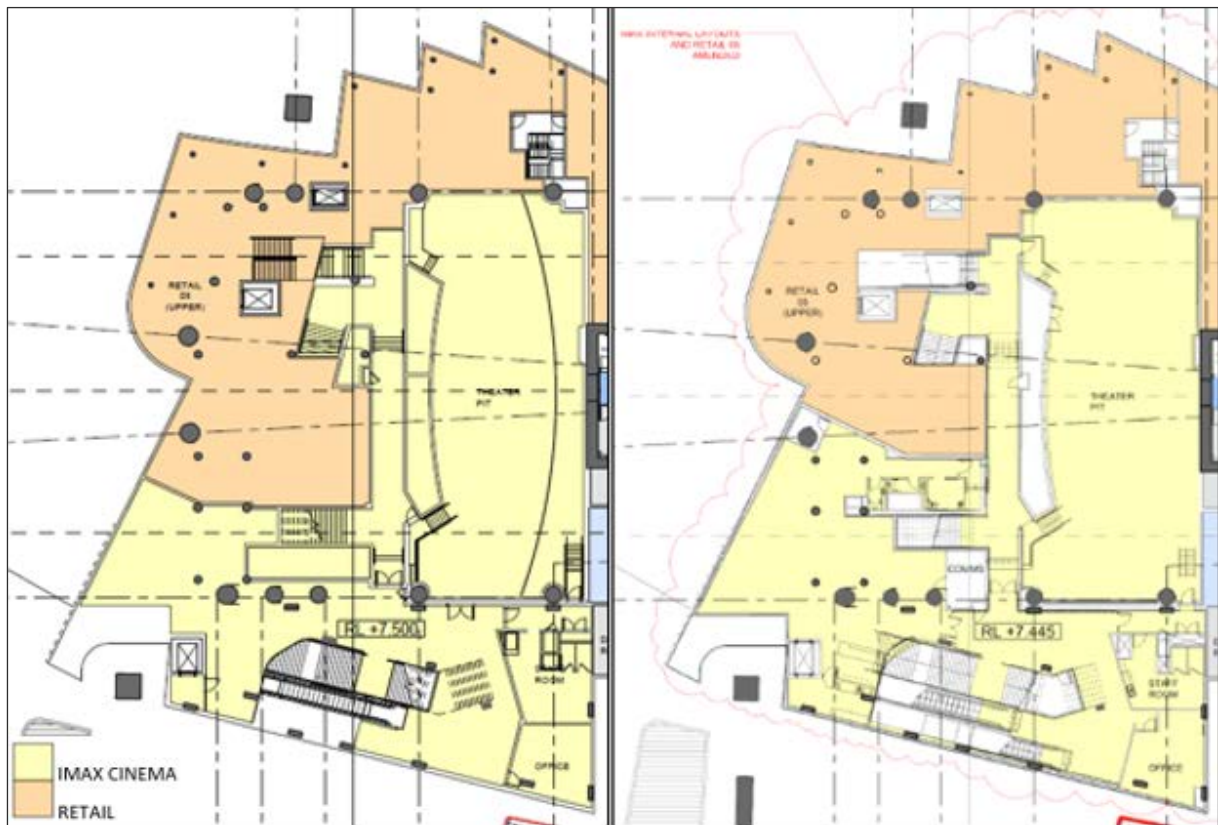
| Existing (left) and proposed (right) Level 1 layout (source: Applicants EA)
